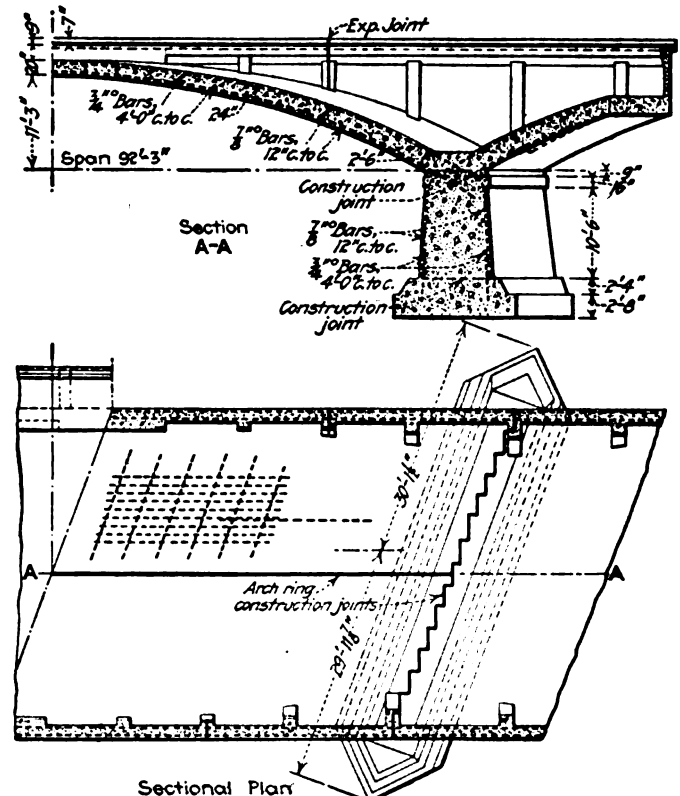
ARCH SECTION AND PLAN EMPHASIZING CONSTRUCTION JOINTS
